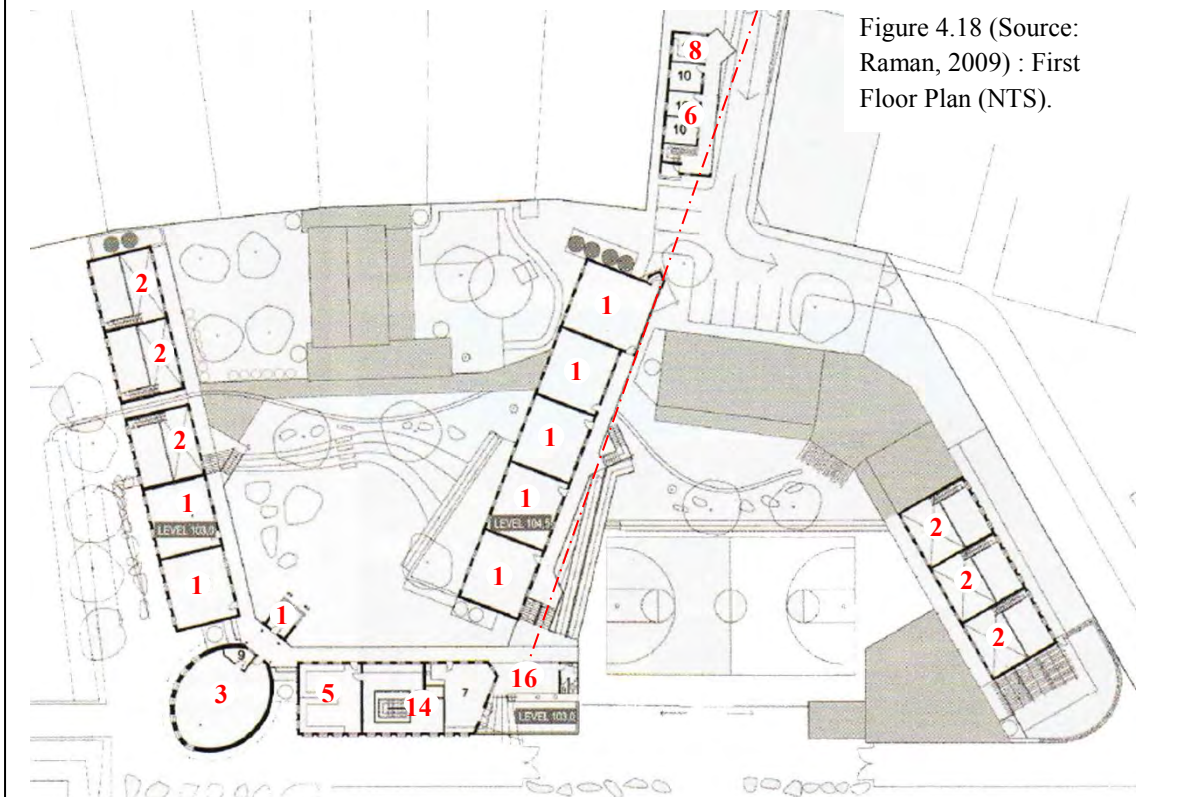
(Source: Raman, 2009) : First Floor Plan (NTS).
